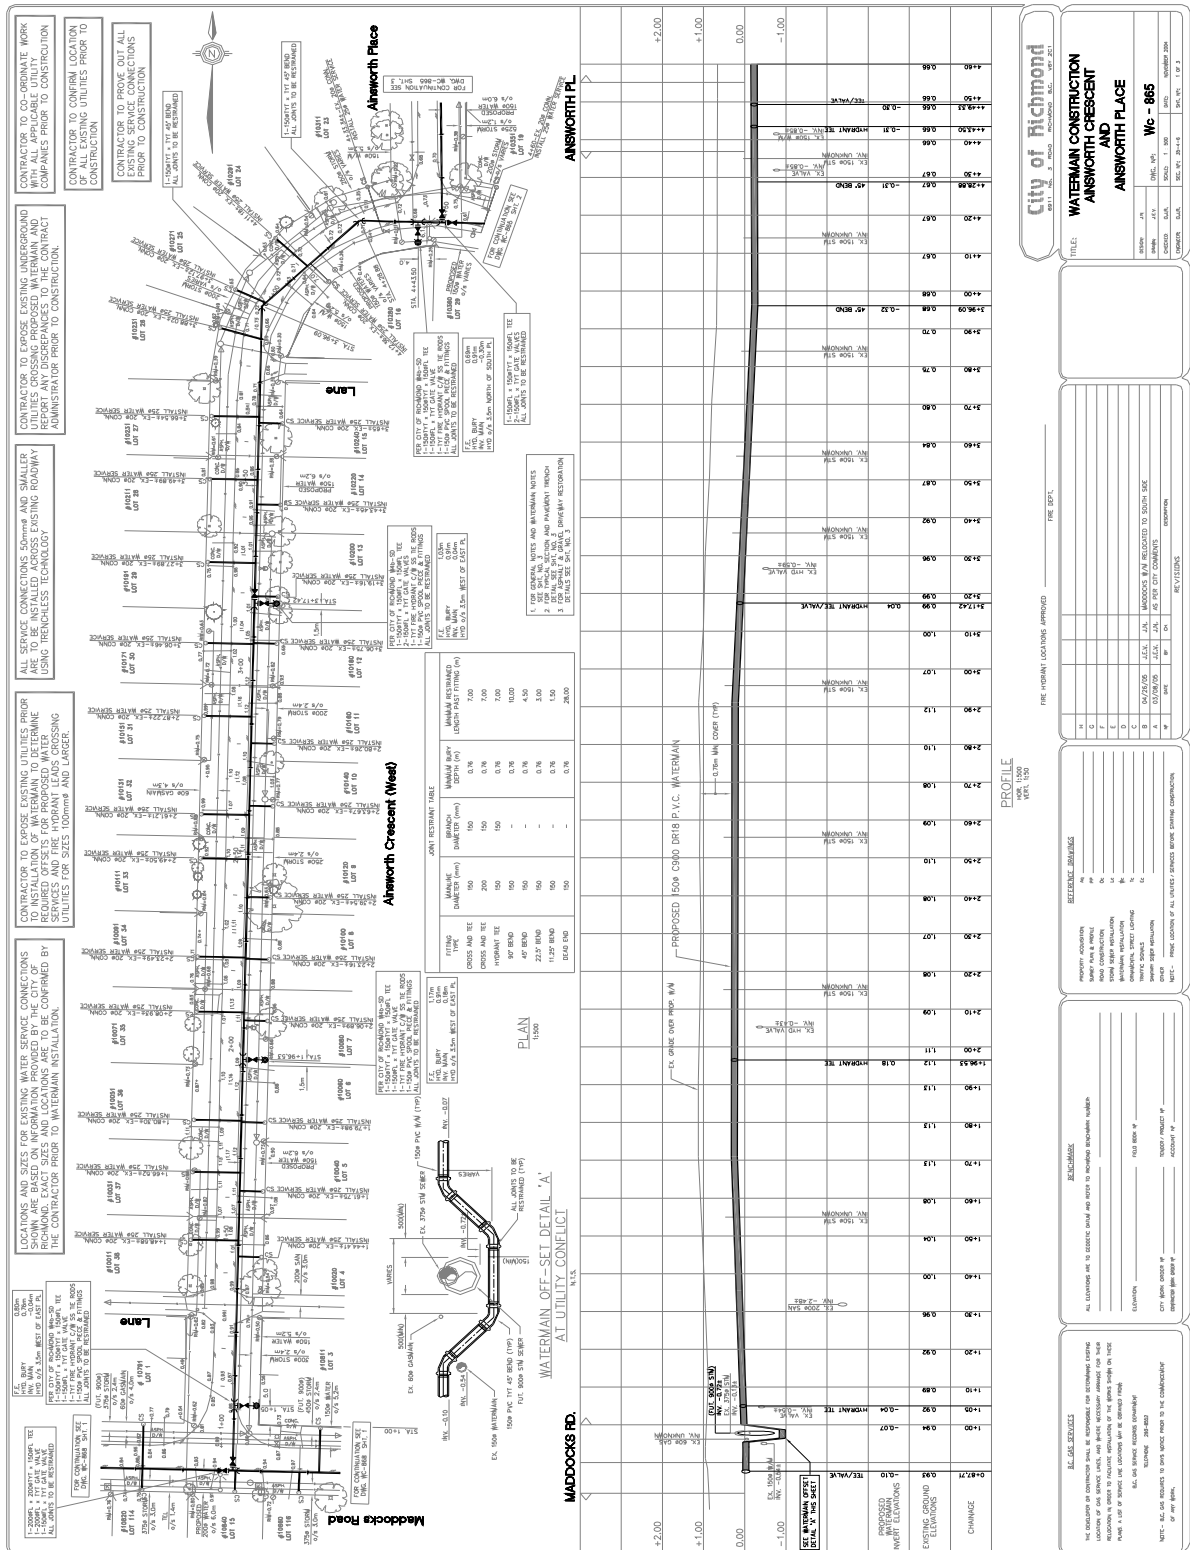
Shellmont AC Watermain Replacement Project Typical Plan and Profile
